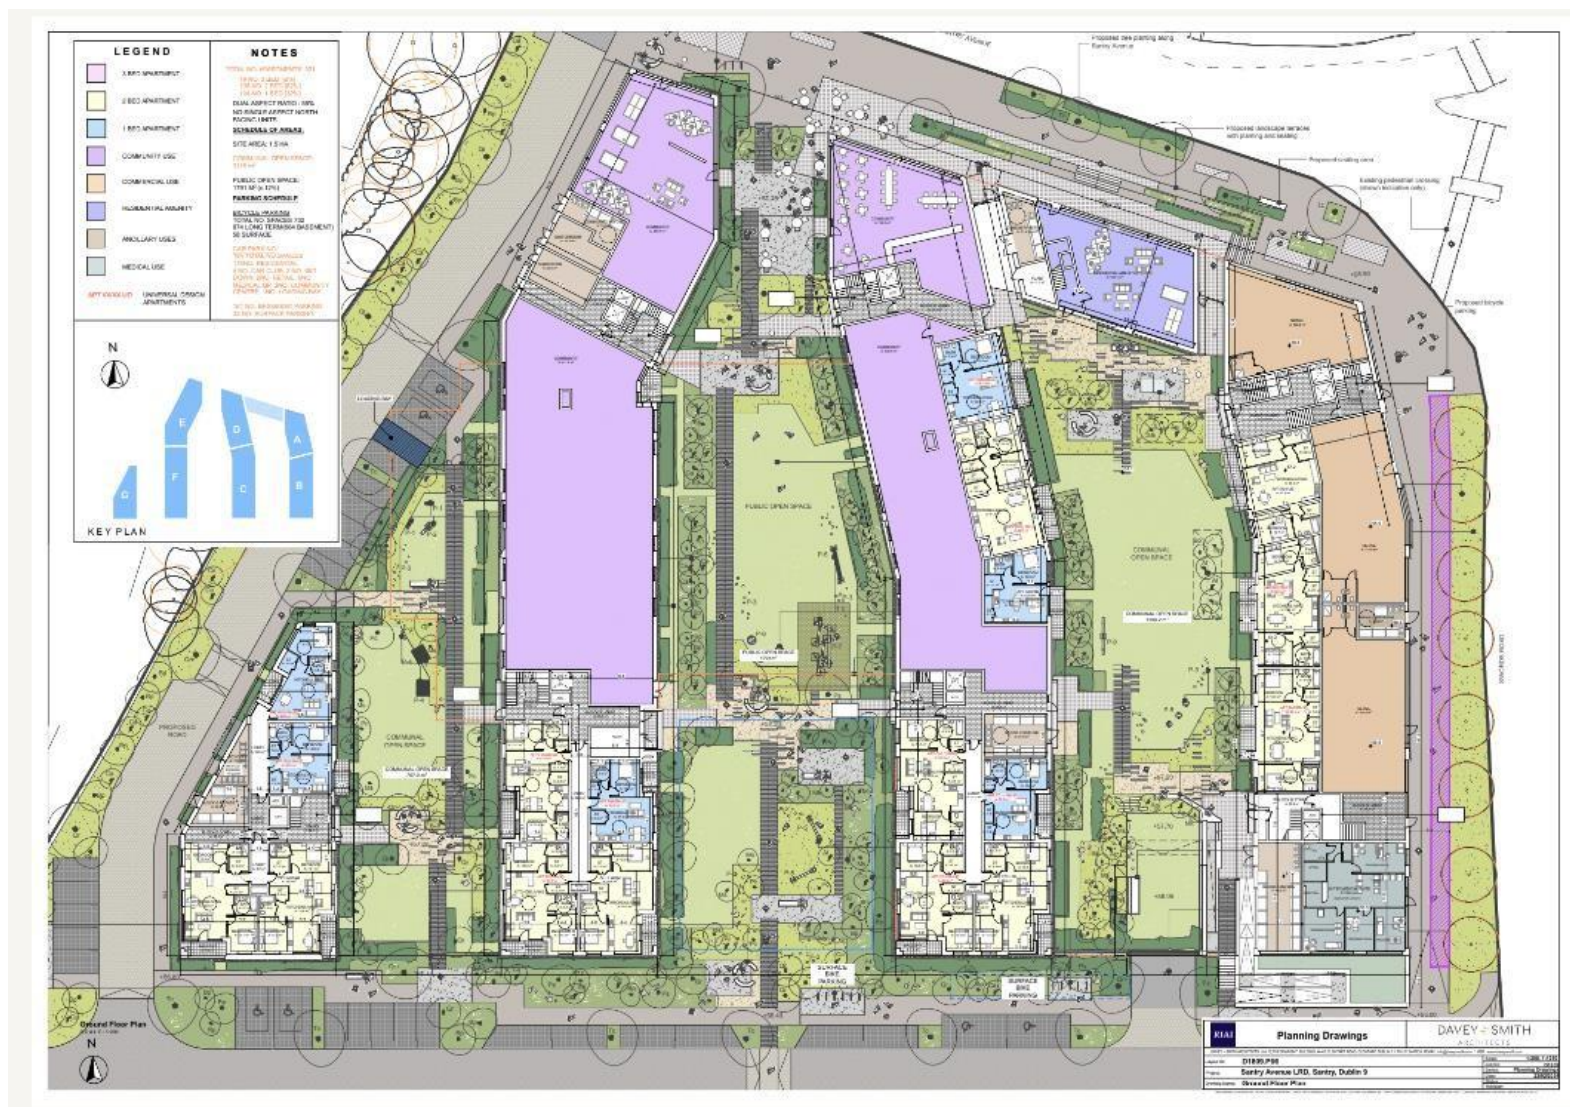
SITE LAYOUT PLAN (DAVEY SMITH, DRG No. D1809.P0)
